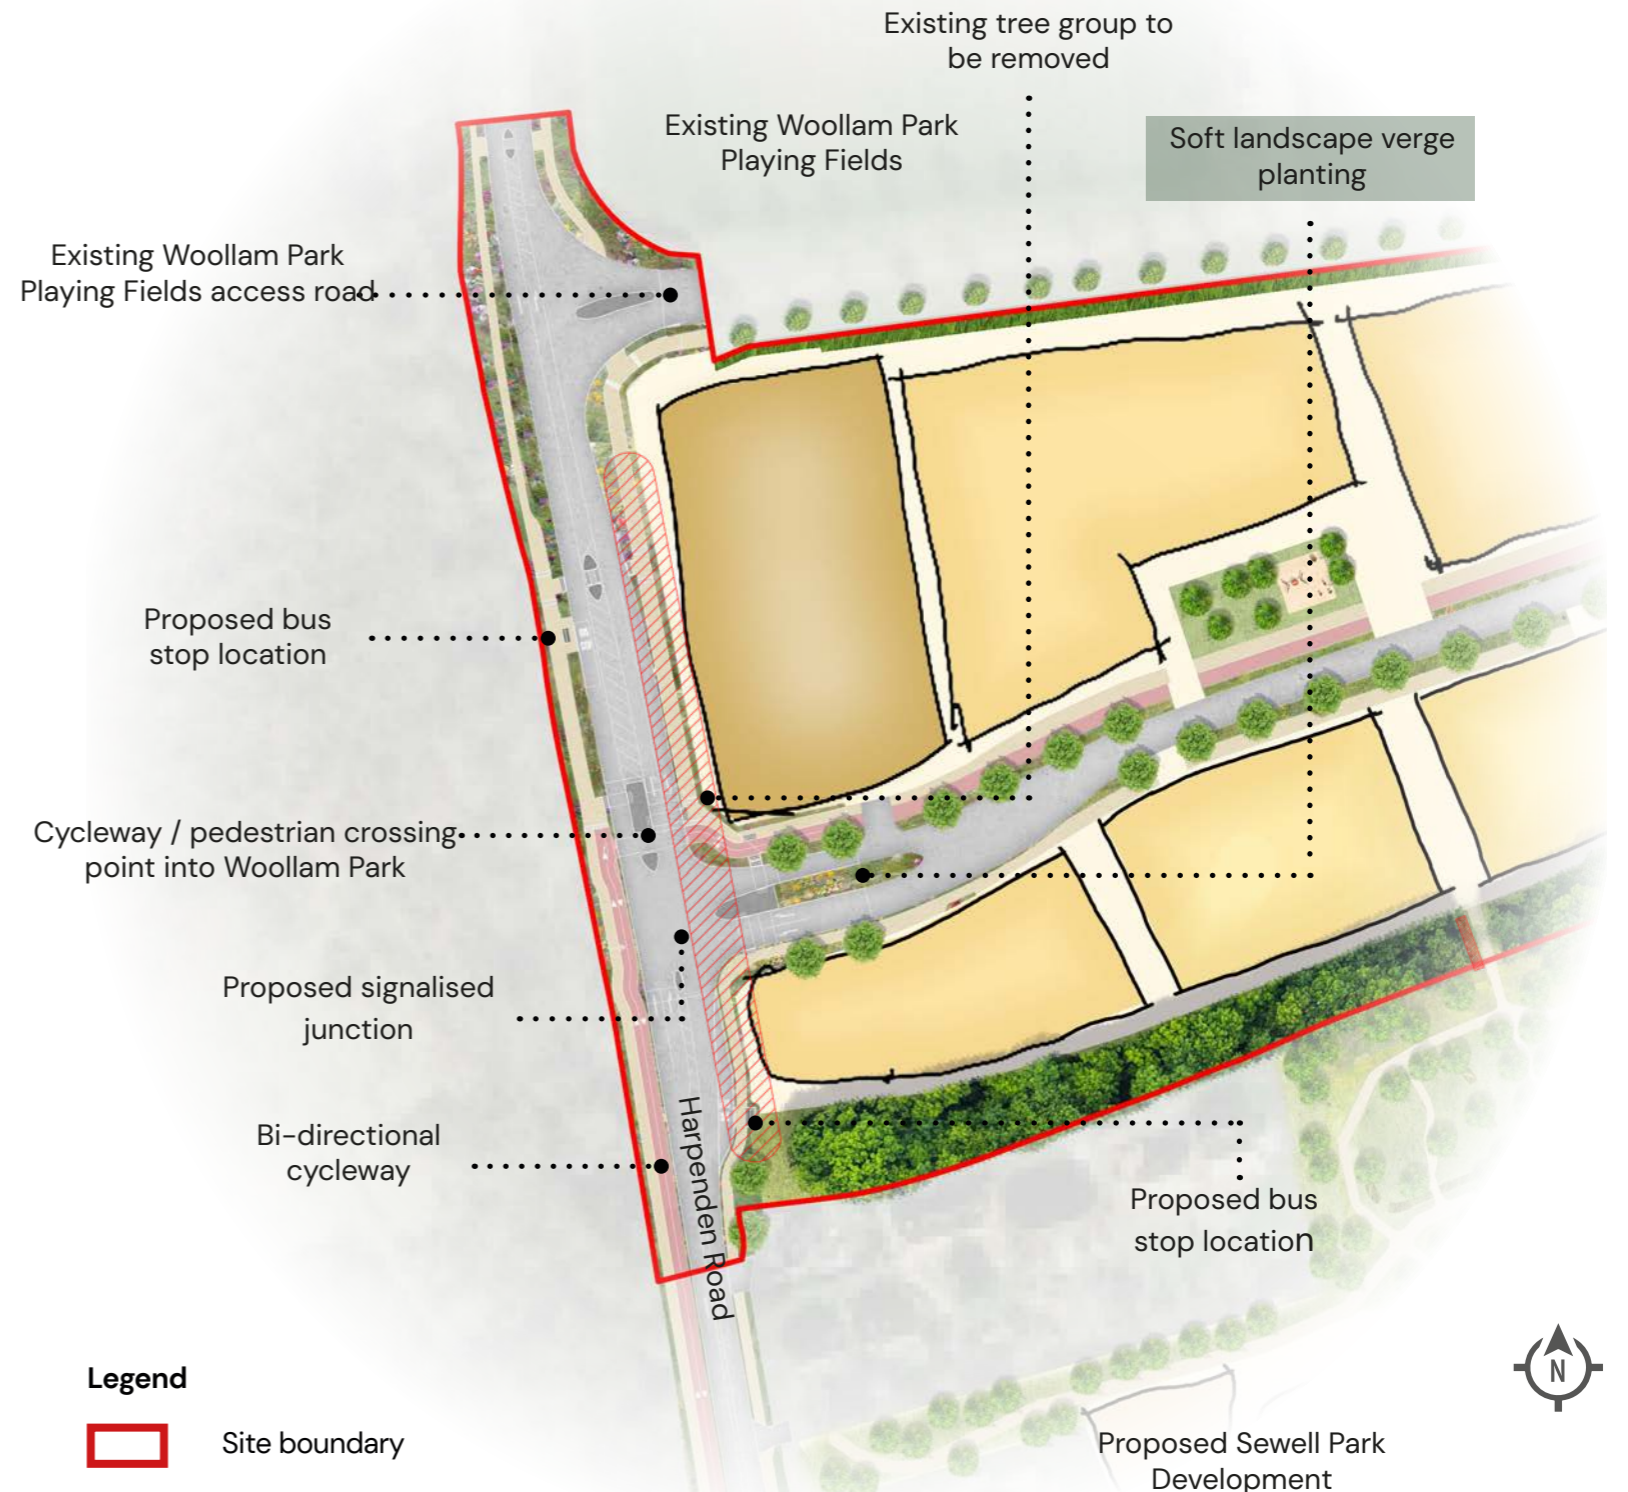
PROPOSAL FOR HARPENDEN ROAD ACCESS SOFT LANDSCAPING
